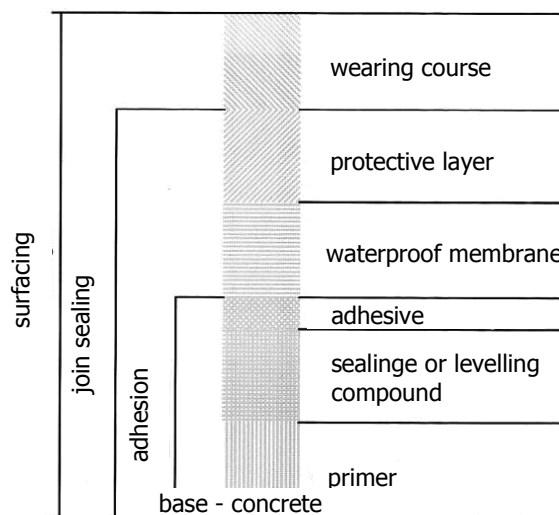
Composition of bridge surfacing ("black bathtub")
